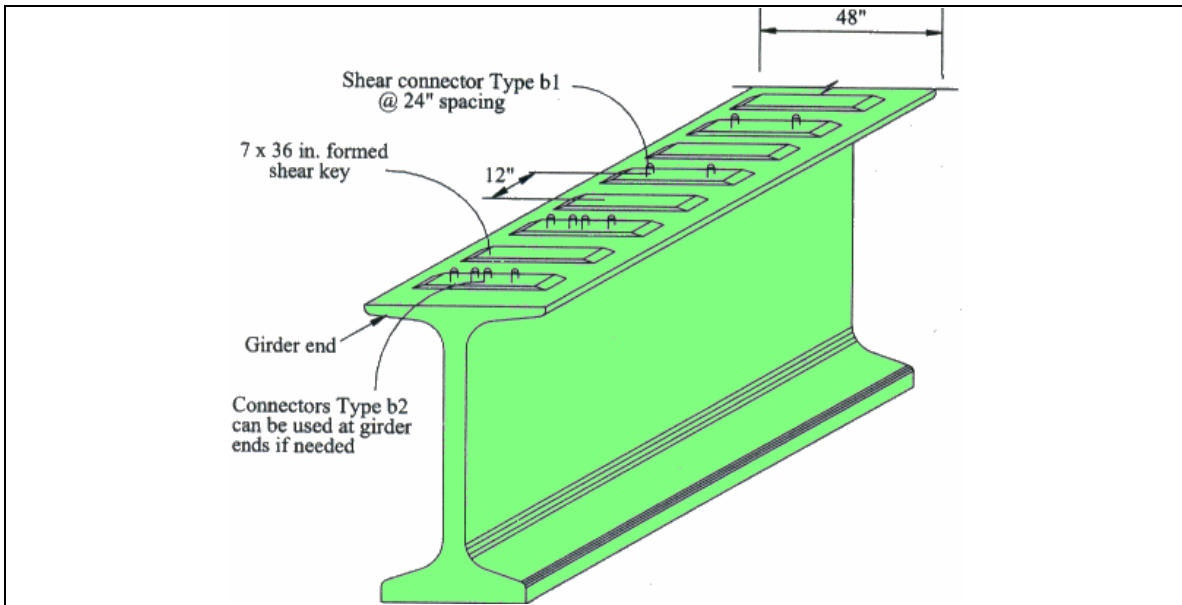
Debonded shear key connection system (Tadros and Baishya, 1998)
